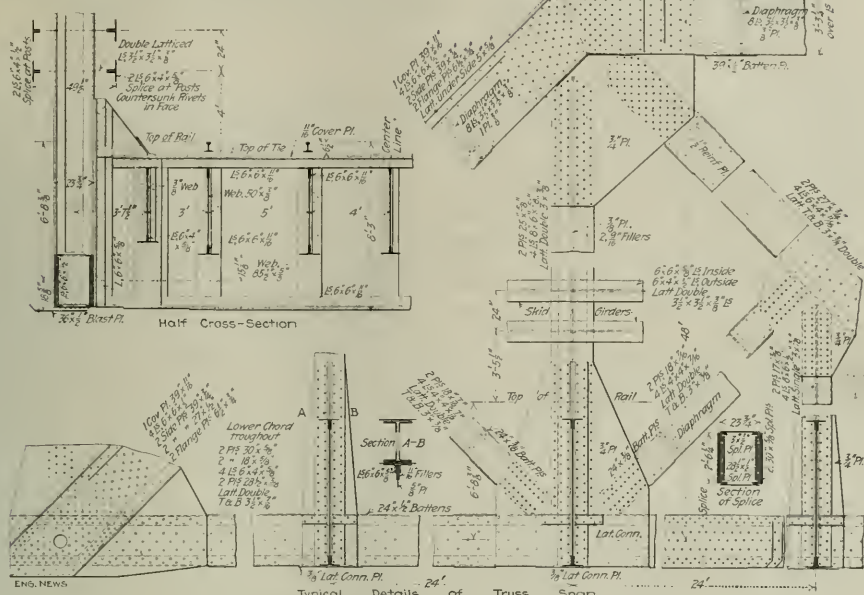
MAHONING RIVER CROSSING; DETAIL OF TRUSS
